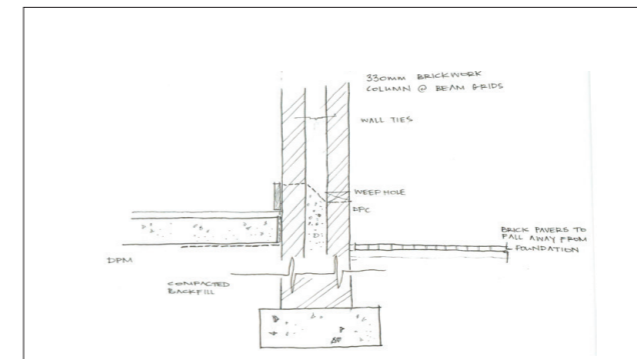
Foundation detail - library and covered stoep. A 330mm cavity wall with brickwork columns spaced according to the beams.
